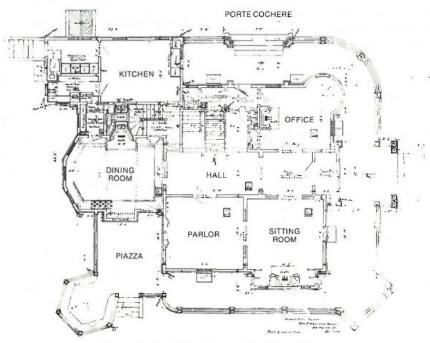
Lord Residence, First Floor Plan. (Courtesy Robert L. Beardsley)
